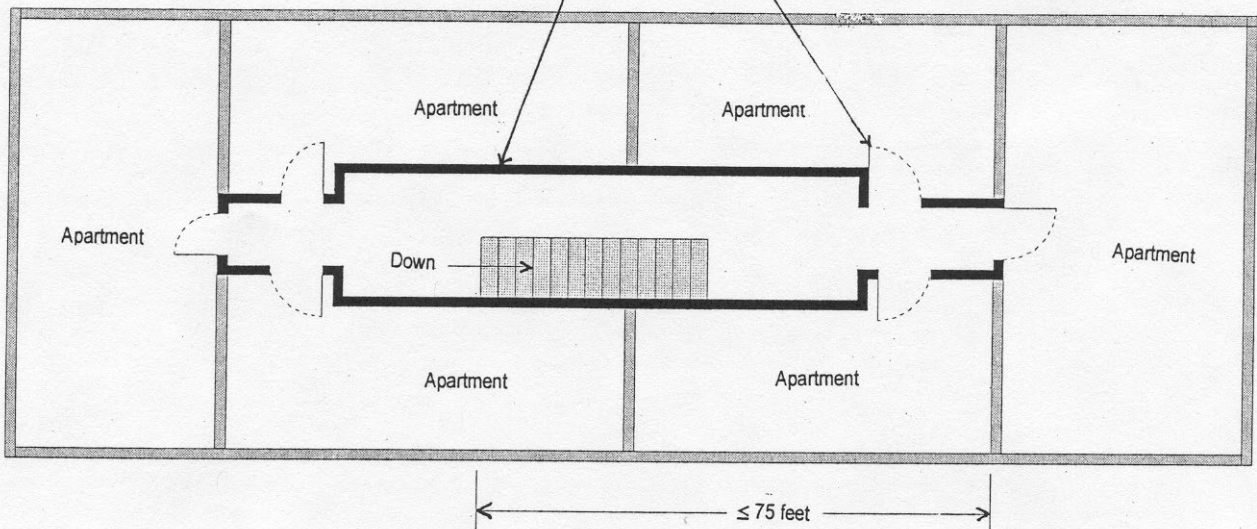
A. Interior exit enclosure for a building with one interior exit and one fire escape or exterior stair.
